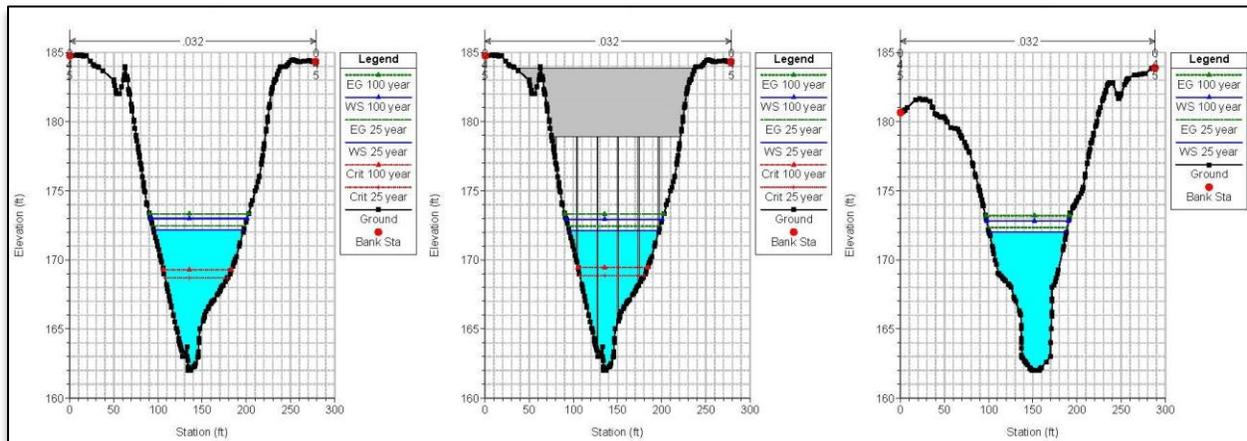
HEC-RAS Upstream, Bridge, and Downstream Cross Sections
